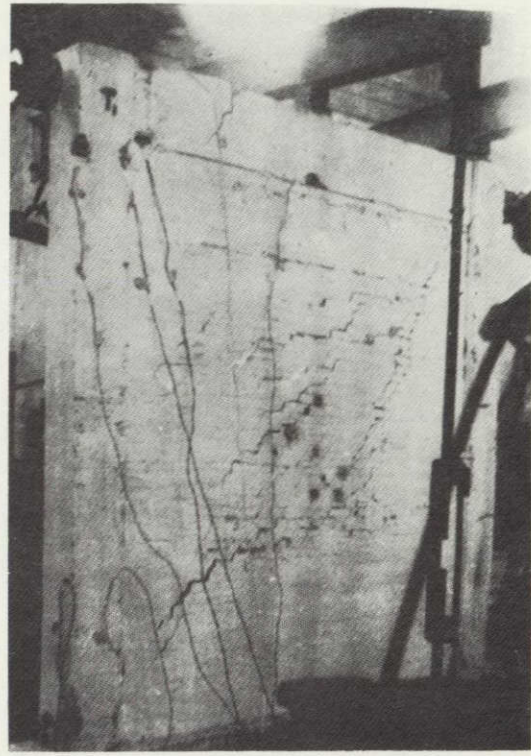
Rahmen structure with brick wall. The load was added until it gave way.
